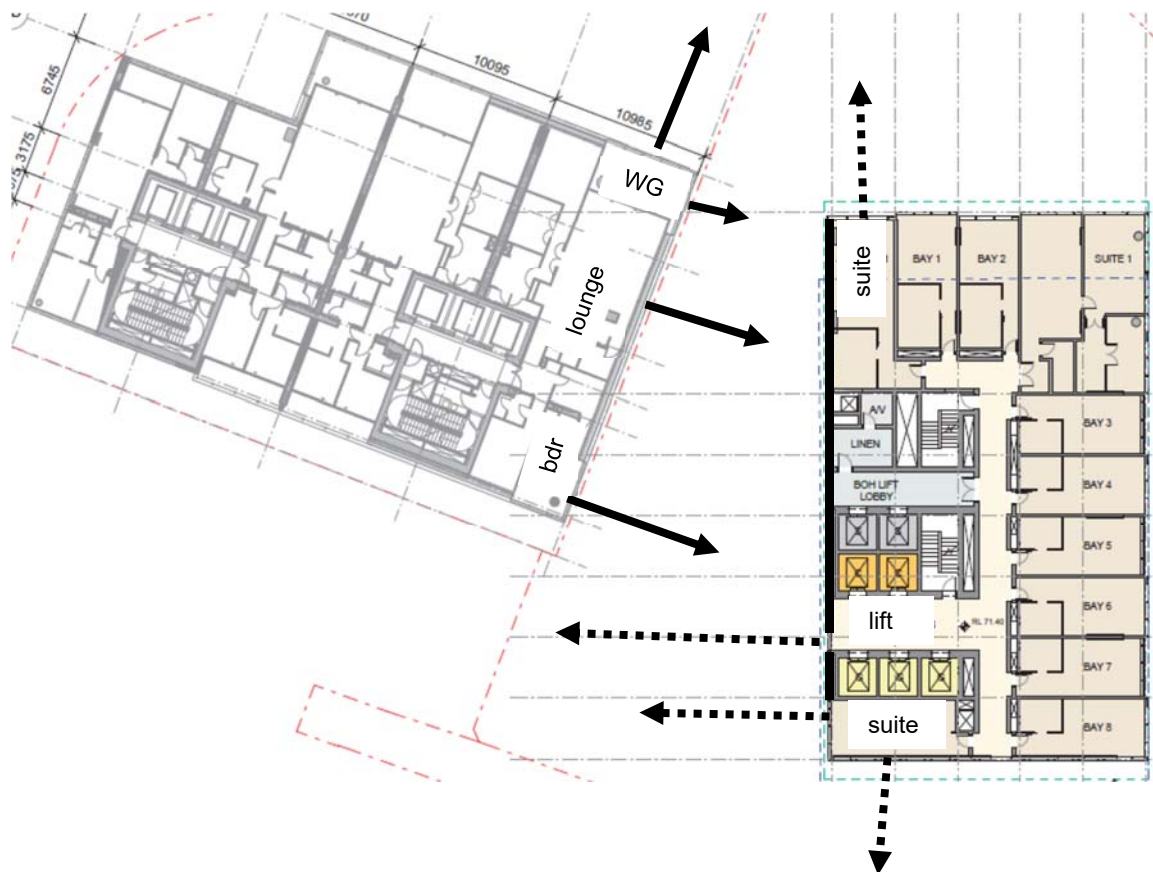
Views at interface of eastern elevation (Tower A) and western elevation (Tower B) at RL 85.0
